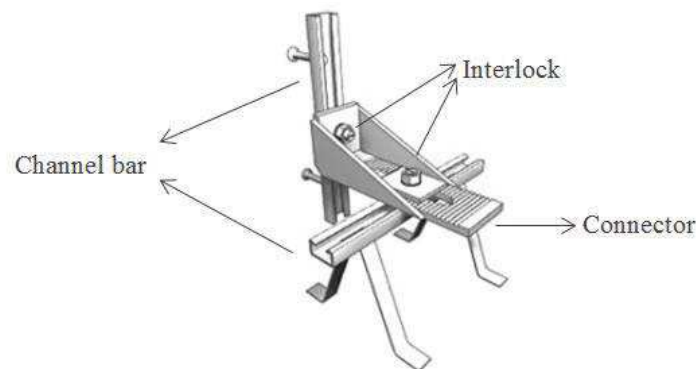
Connection of a precast vertical panel to the beam in one-storey precast structures
